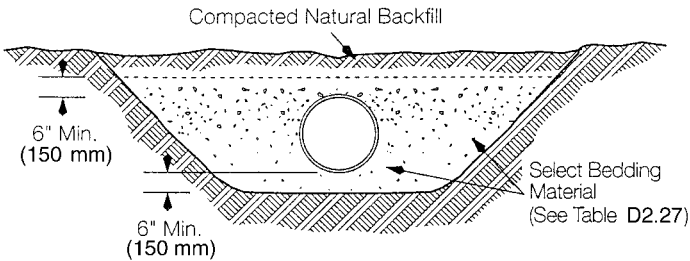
Trench shape and bedding for granular type soils (sand, etc.).
